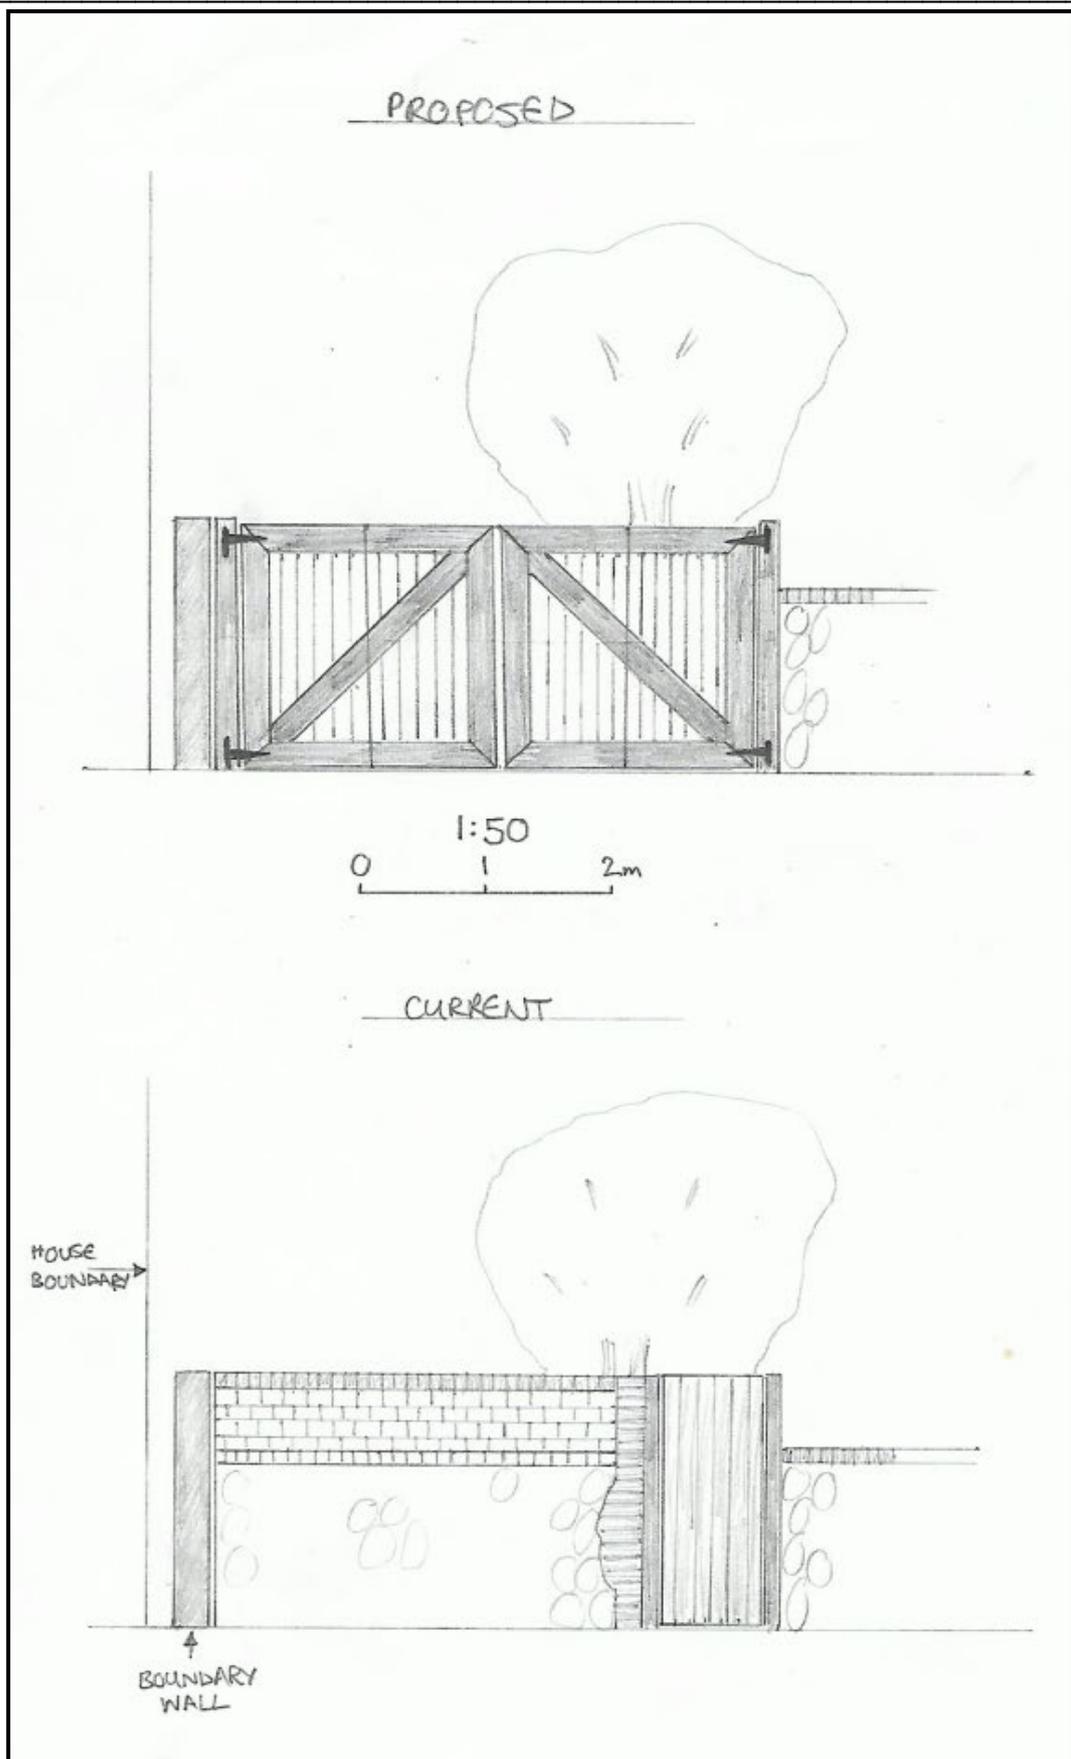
Existing and proposed elevation fronting Barrow Hill Cottages
